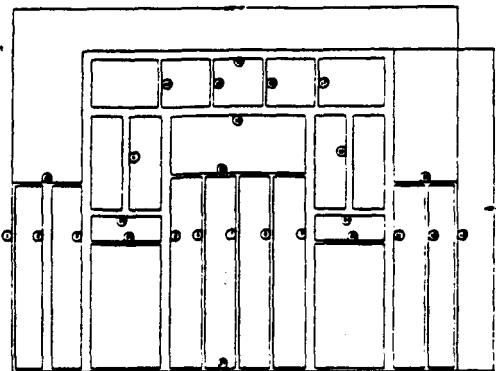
Shear Walls of the Central Part of the WHB at the First Floor (Elevation -25 ft to Grade)
